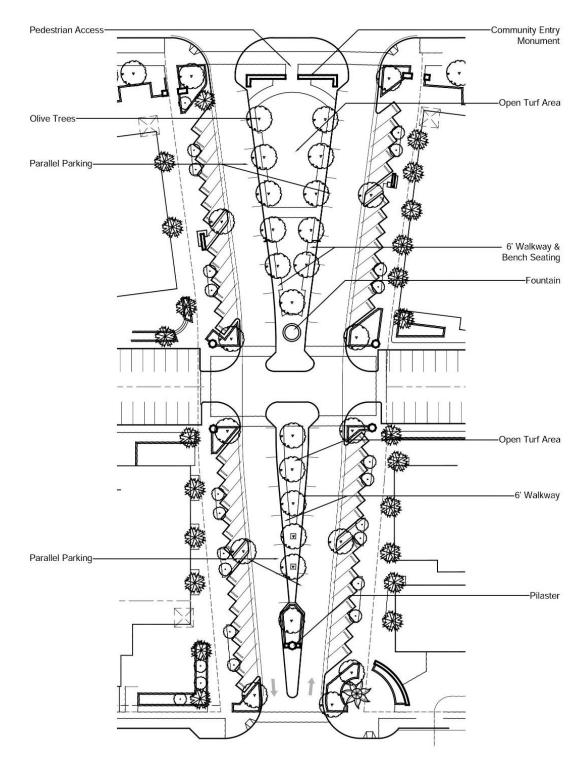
Private Open Space (POS-14) Concept Plans
